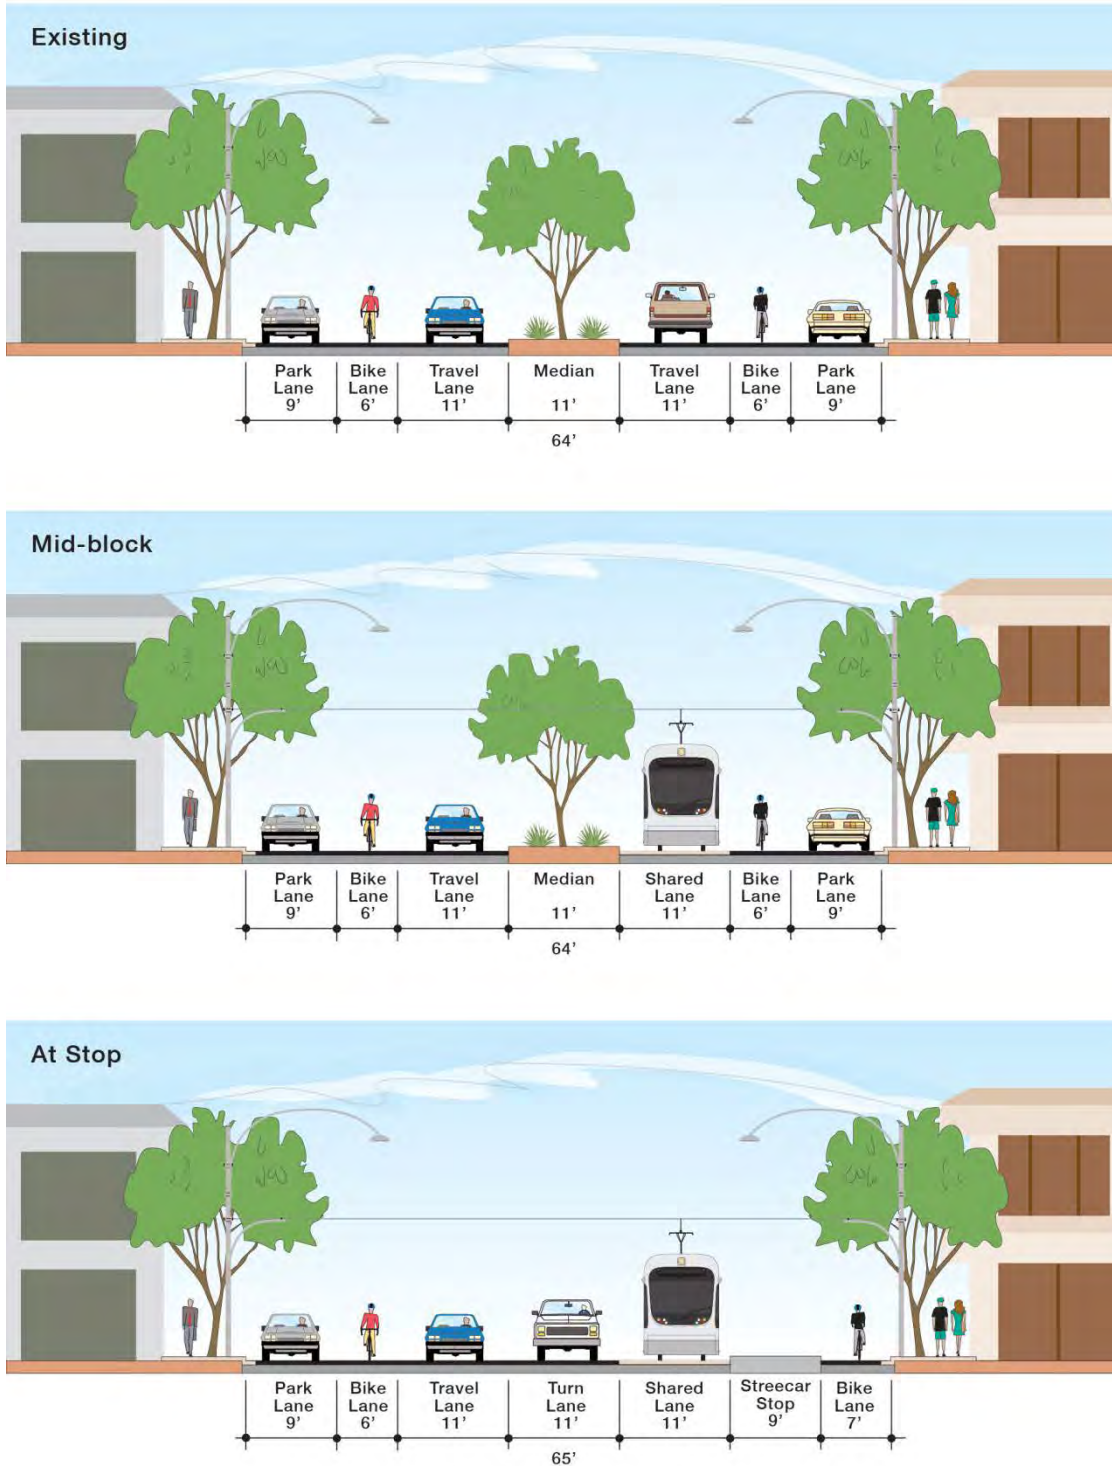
BUILD ALTERNATIVE, MILL AVENUE SOUTH OF UNIVERSITY DRIVE – LOOKING NORTH
